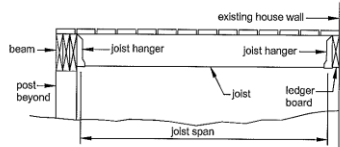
JOISTS WITH FLUSH BEAM - DECK ATTACHED AT HOUSE
